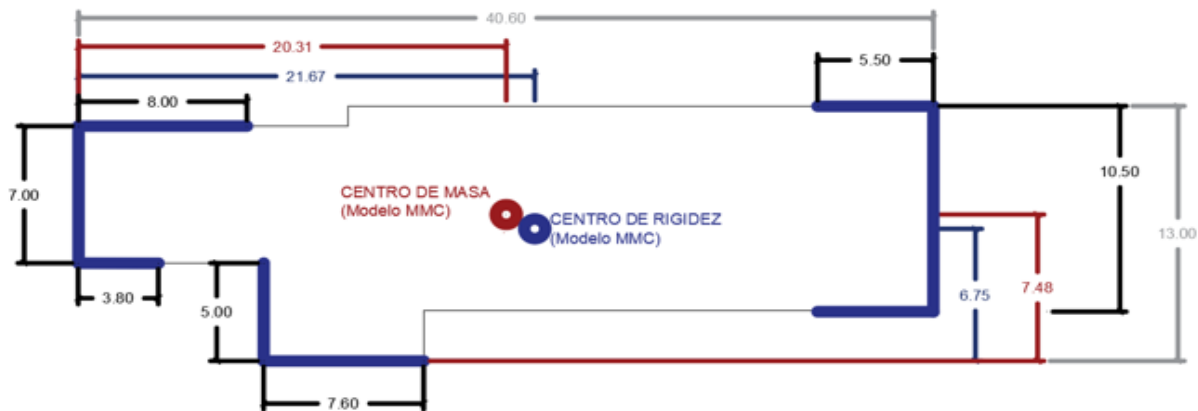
Distribution of Shear Walls and Braces in Structural Plan (units in meters).
